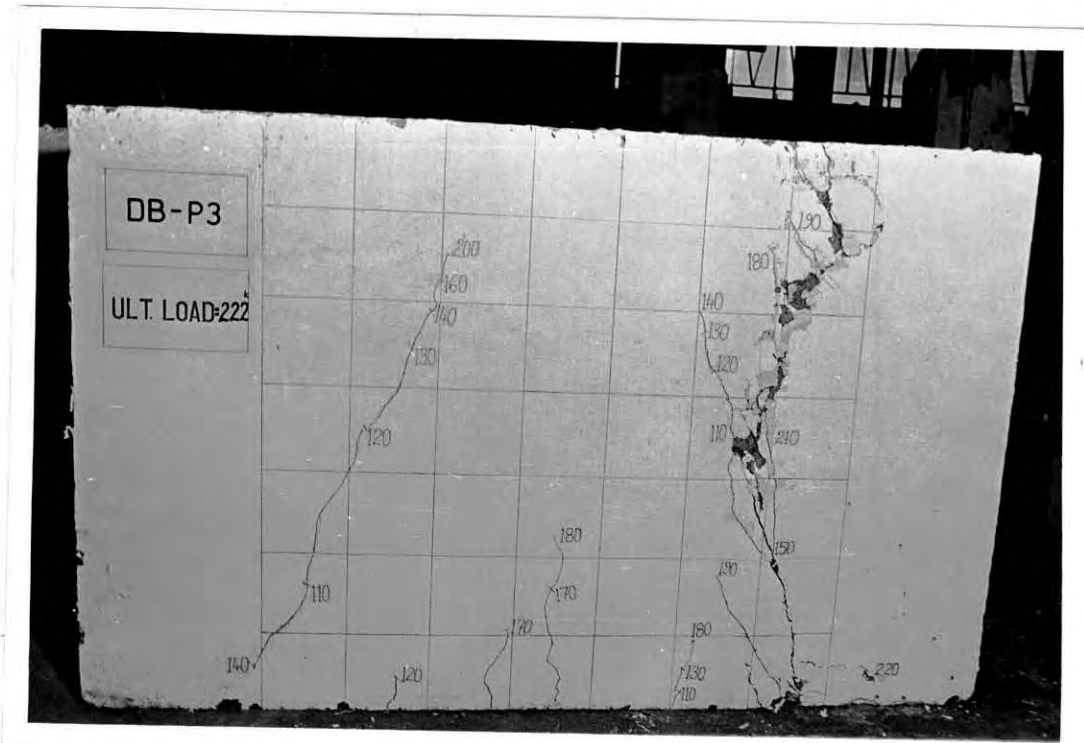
Mode of Failure and Crack Pattern of Beam DB-P3
